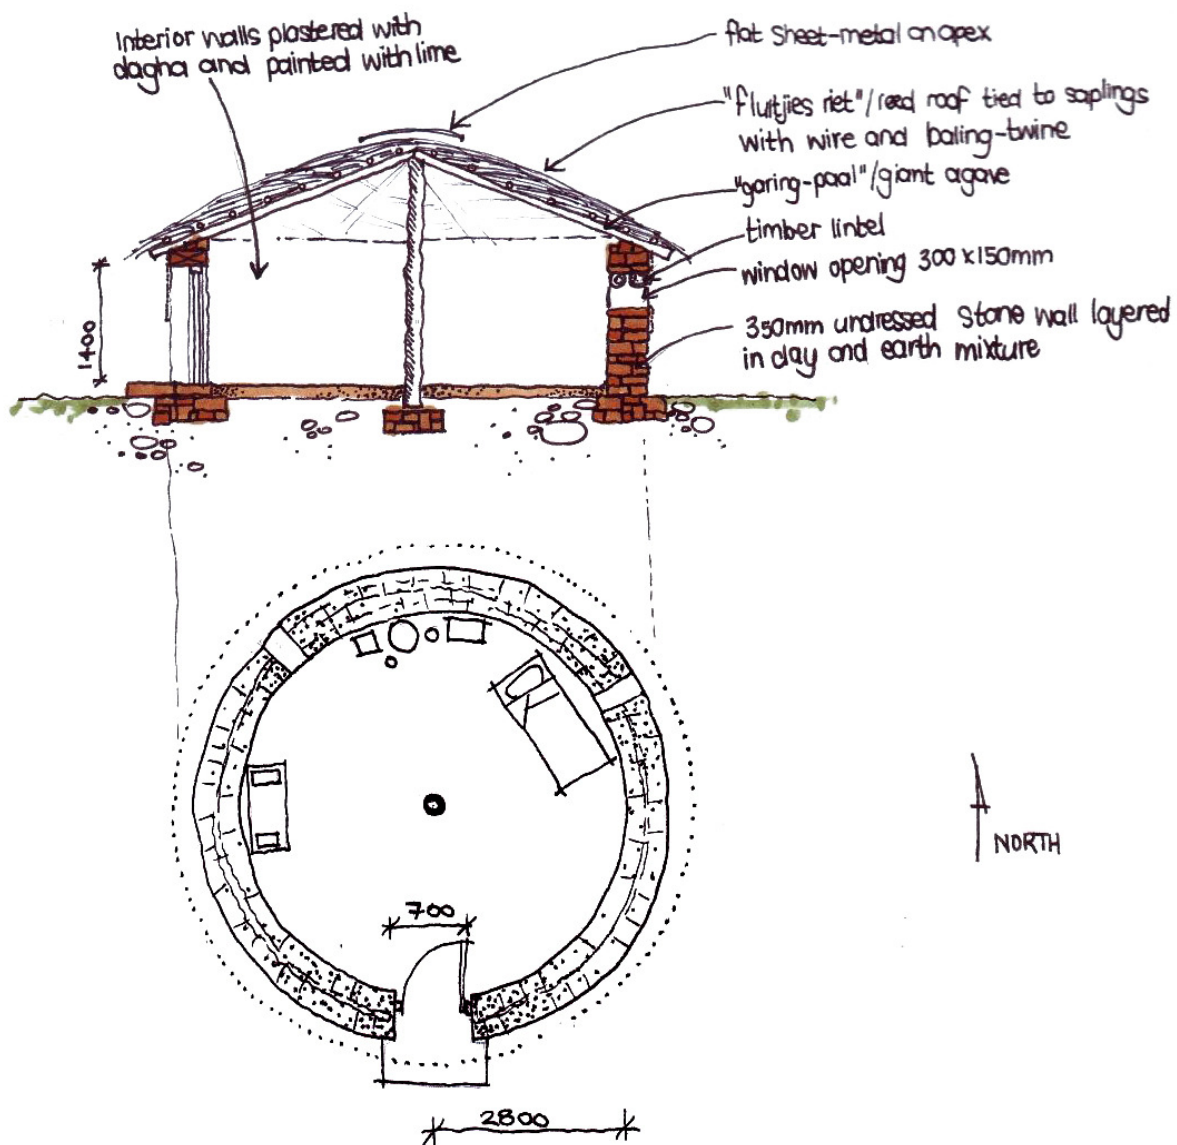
Section and plan illustrating the construction and spatial layout of the rondavel on the R390 between Hofmeyr and Steynsburg
